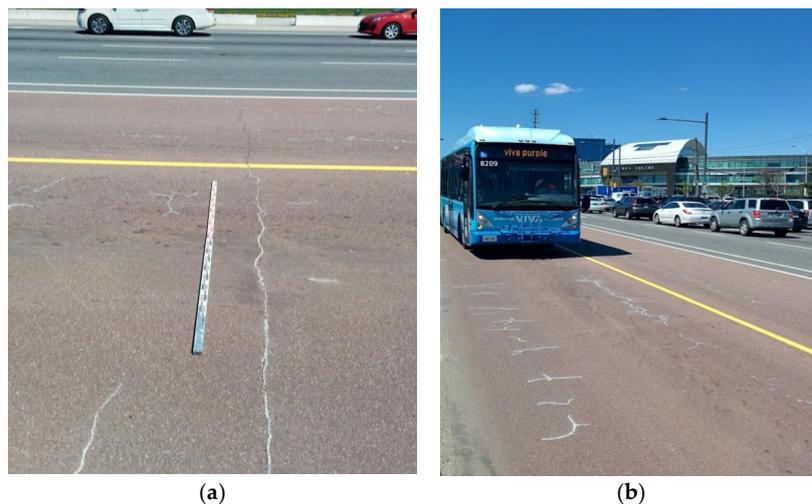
Early signs of cracks observed in sections paved with the Initial Red mixture after few years of in-service: (a) premature thermal cracking; (b) wheelpath fatigue cracking. The white colour of cracks is because of a chalk used for mapping.
